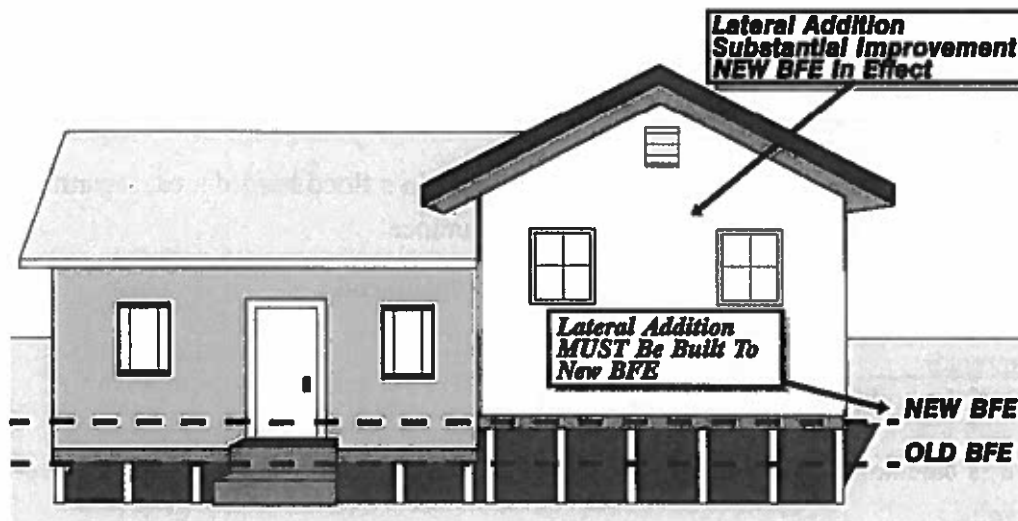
Substantial improvements to post-FIRM buildings must be elevated above the new BFE. Nonresidential buildings may be floodproofed
